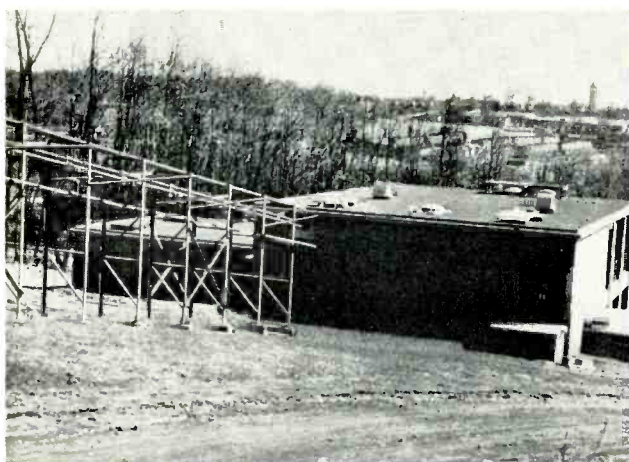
The transmission line of each station is run to the tower on a steel frame as shown here at the WBAL building. Small pipes have been mounted over the lines to prevent damage from falling ice.
